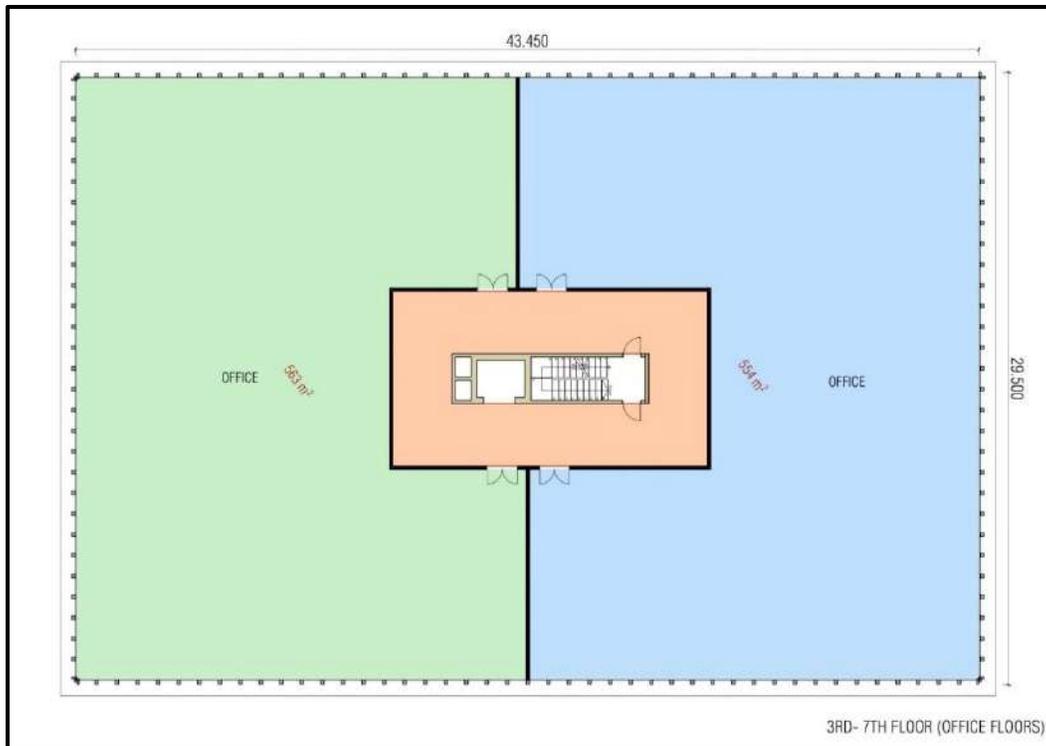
Conceptual Third- Seventh Floor Plan (Office Floors)
